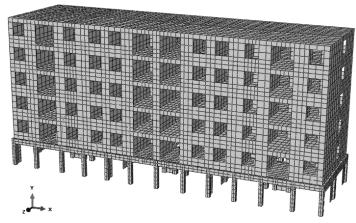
The 3D solid finite element model of 6-story masonry buildings
